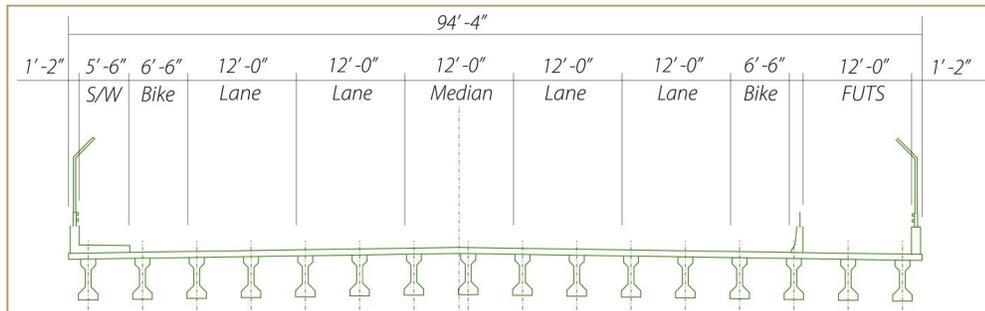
Fourth Street Bridge replacement typical section (looking south on Fourth Street)
